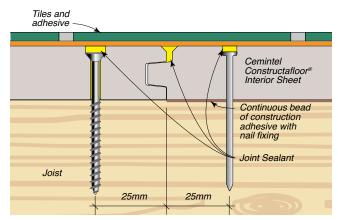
Typical Butt Joint with Direct Fixed Tiles
